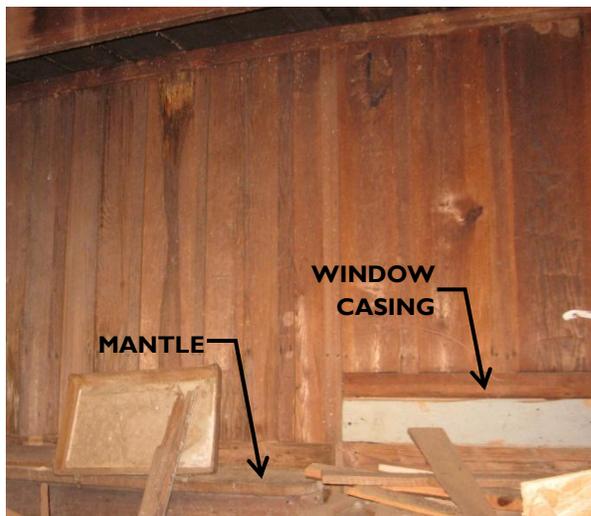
Tenant House. Board-and-batten paneling on east wall of Hall.
